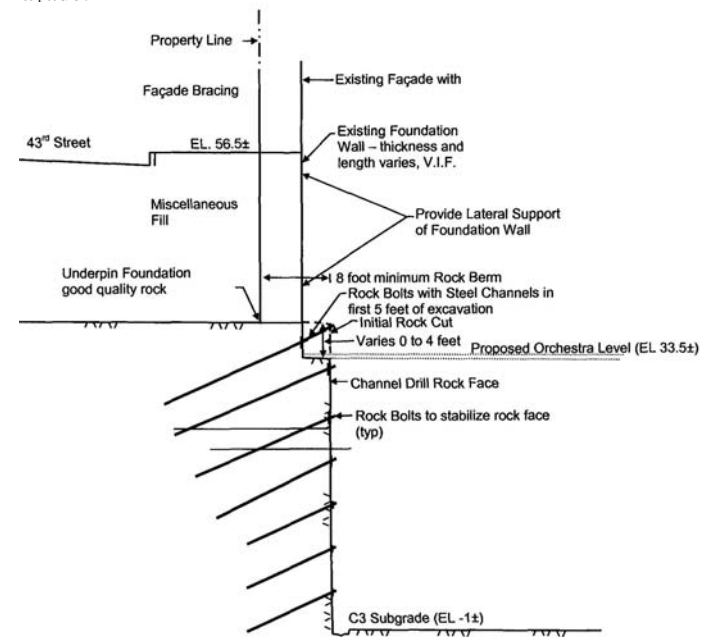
Conceptual Section Adjacent to Henry Miller Theater
